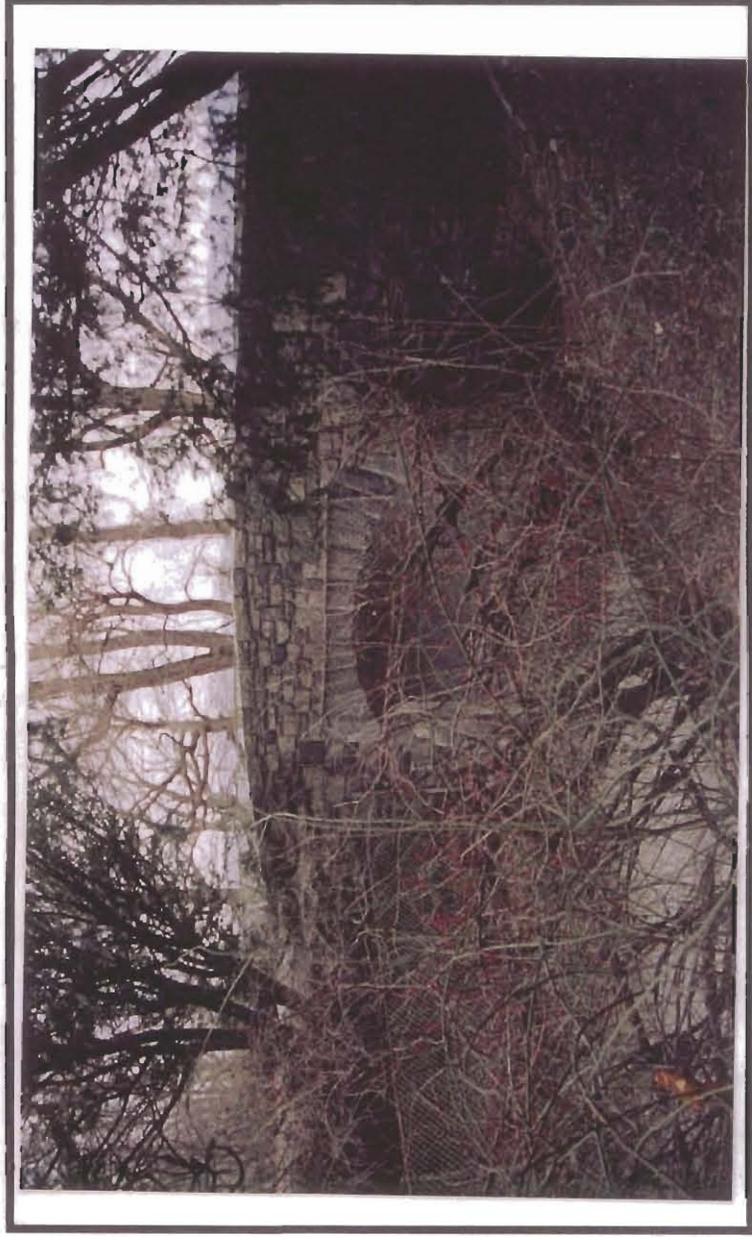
Underpass to beach at bath house in Kingsland Point Park. View to southwest.
